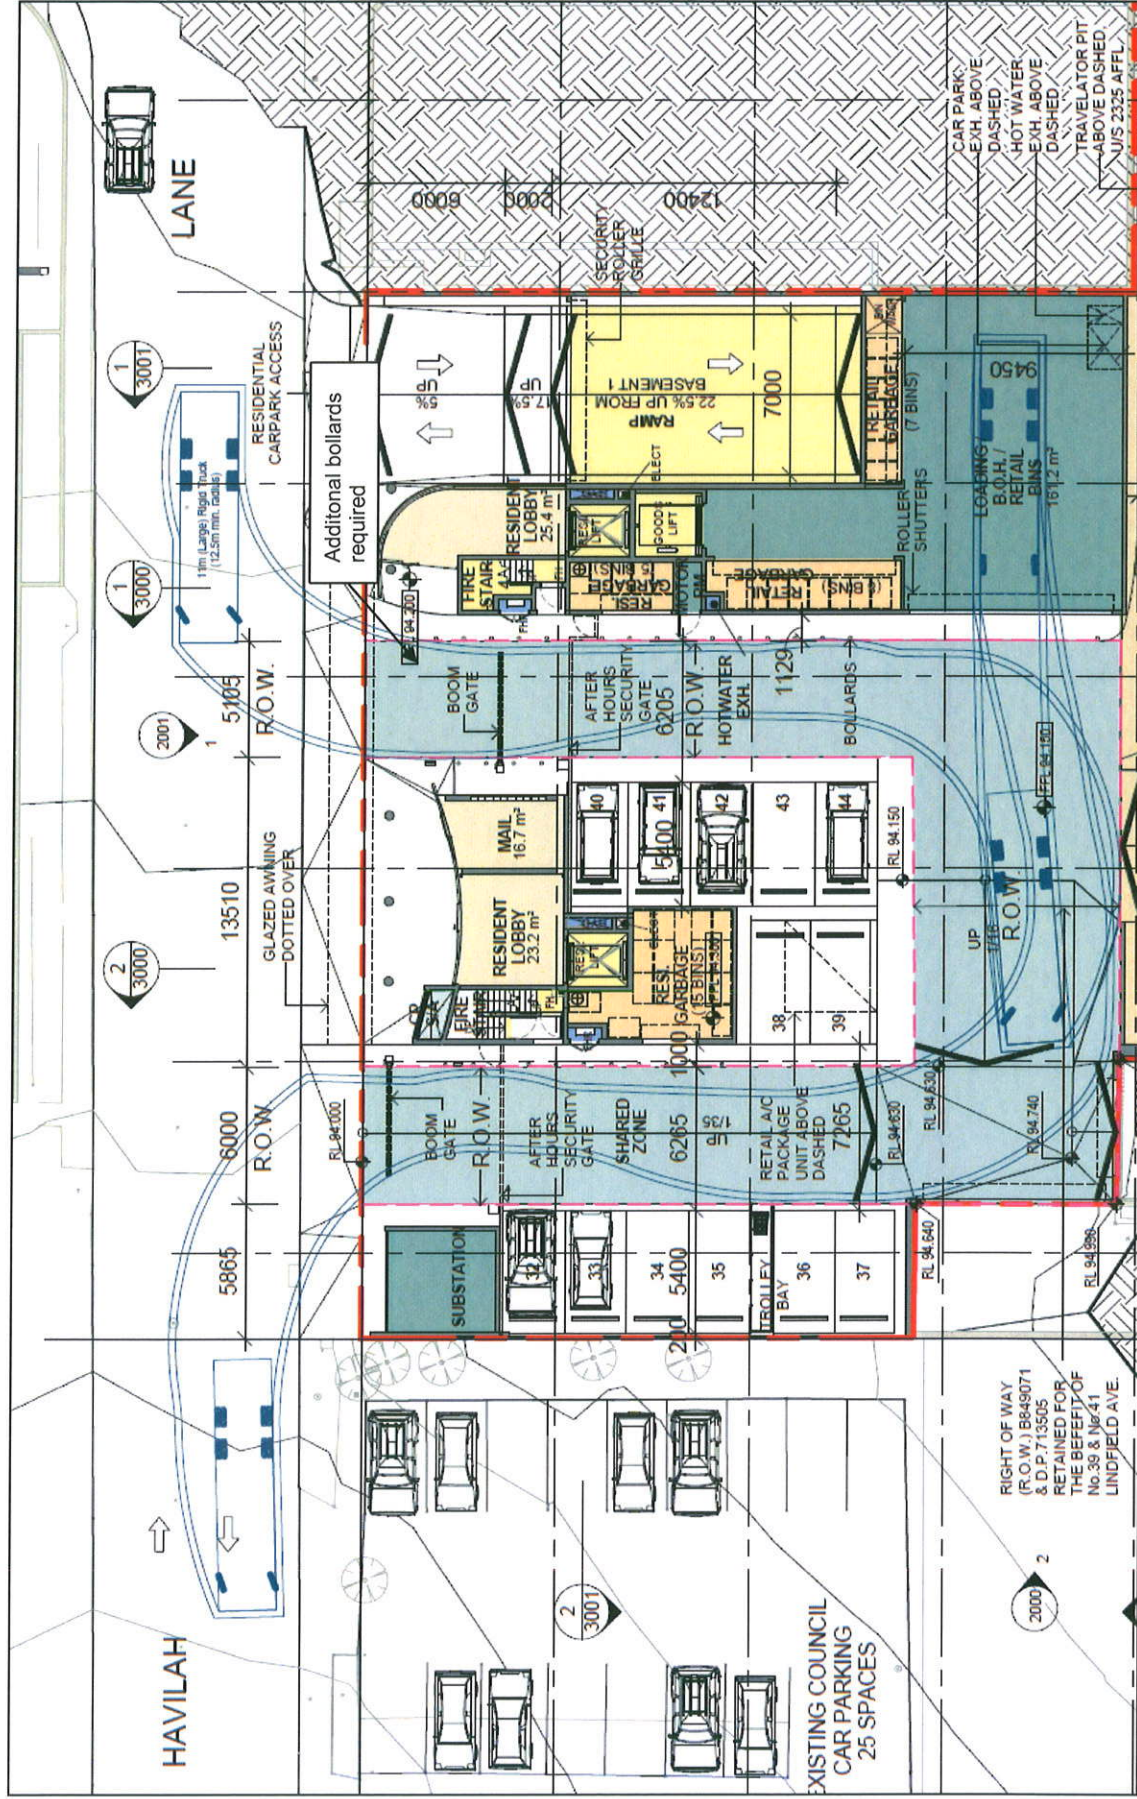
Swept path upper basement level access. ROW shown shaded green. (Source: Proponent's RtS)
